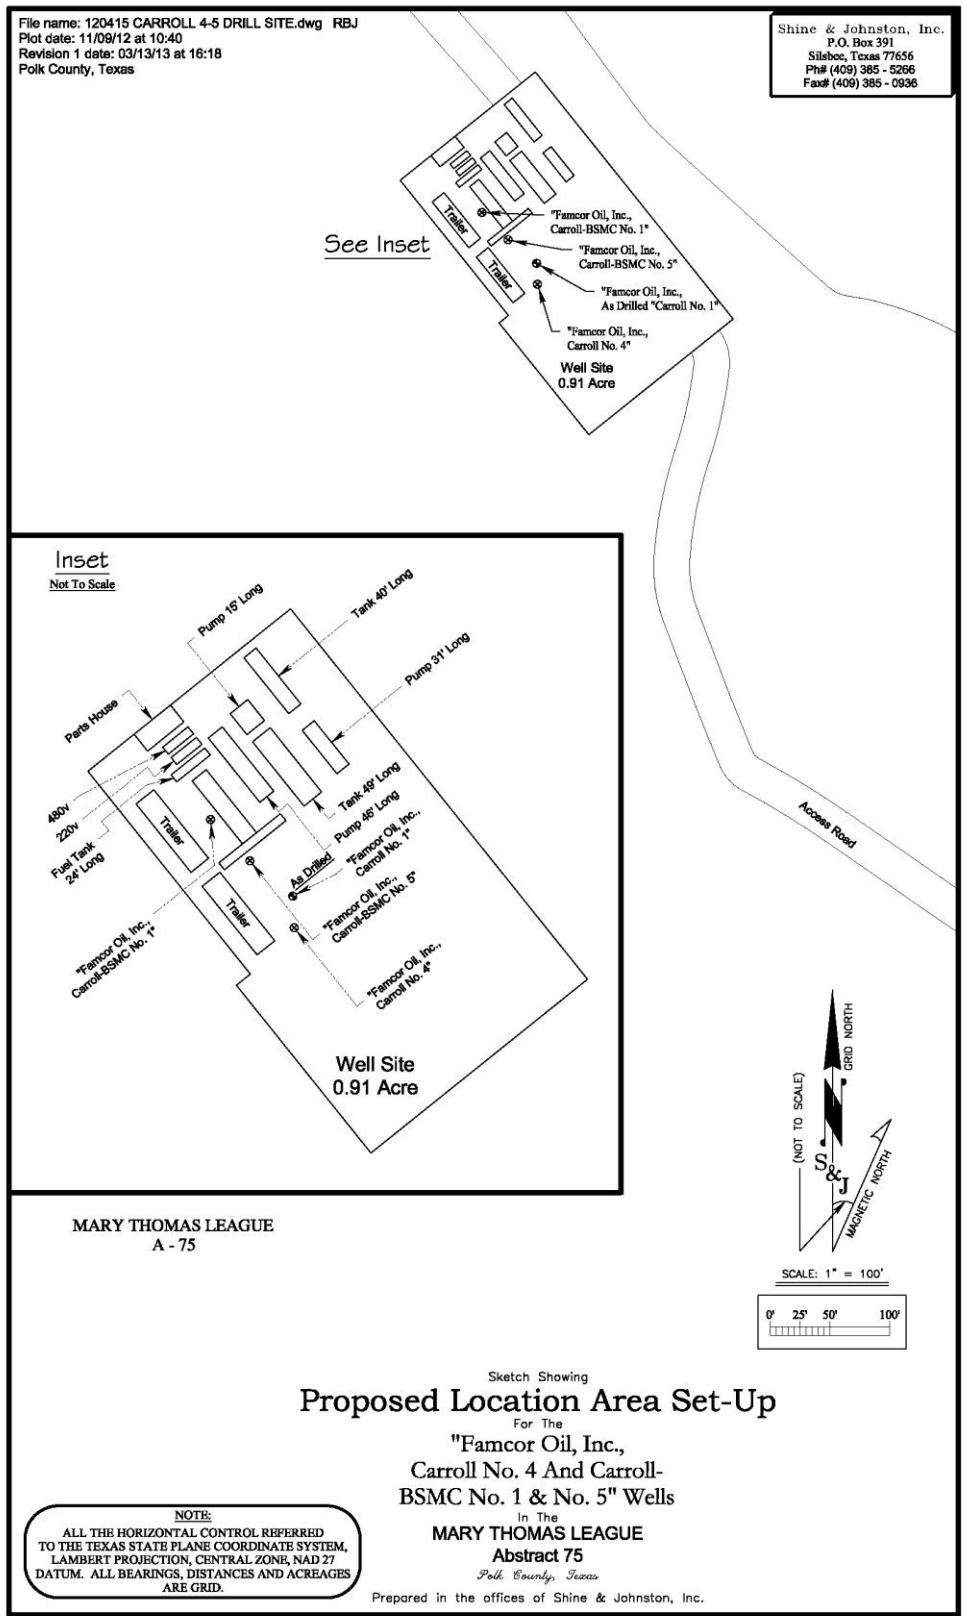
Drilling Layout Plat for the Proposed Carroll 1-4-5 Wells.
